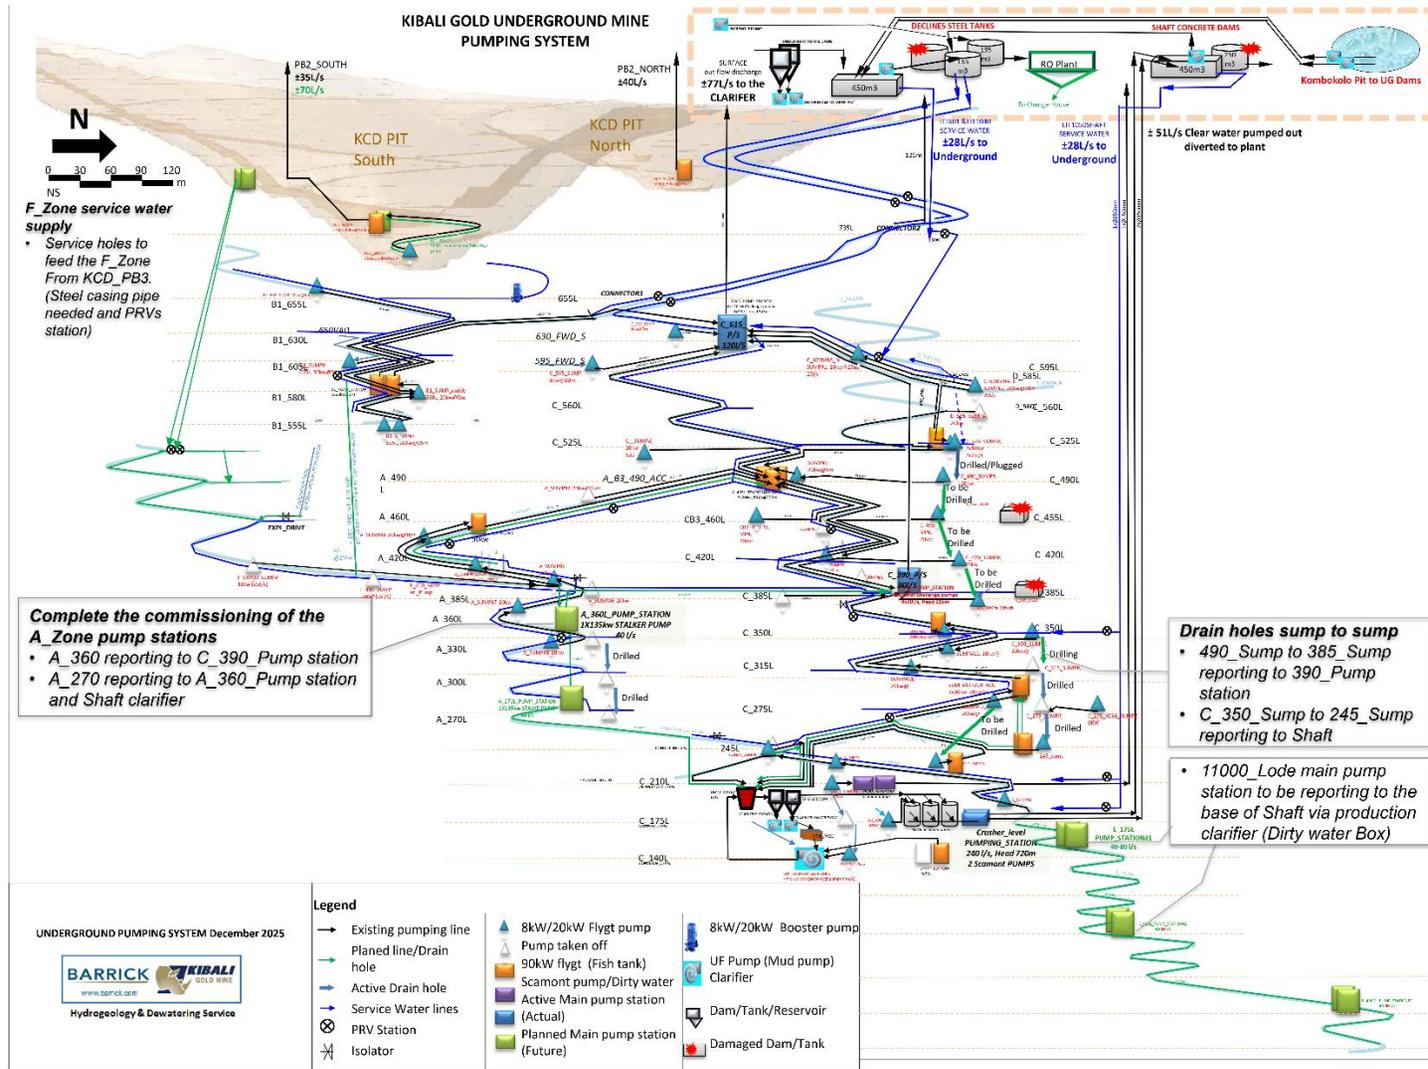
Underground Pumping System Infrastructure Diagram (looking northwest)
